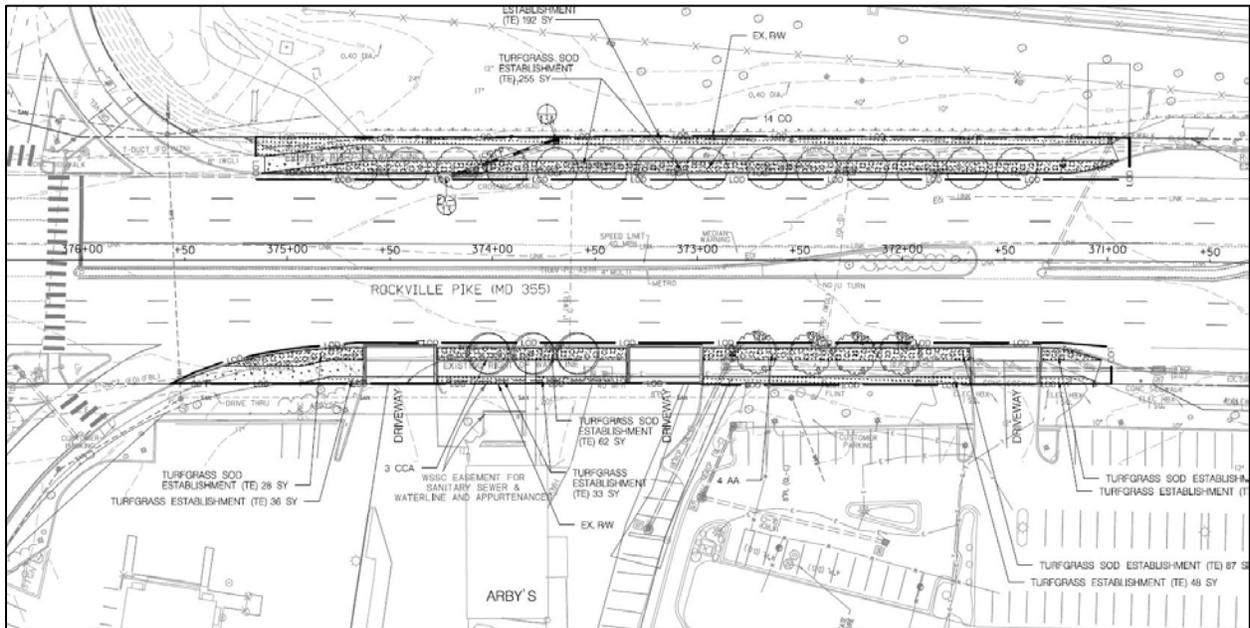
Plan View – Phase 1 Sidewalk Improvements
